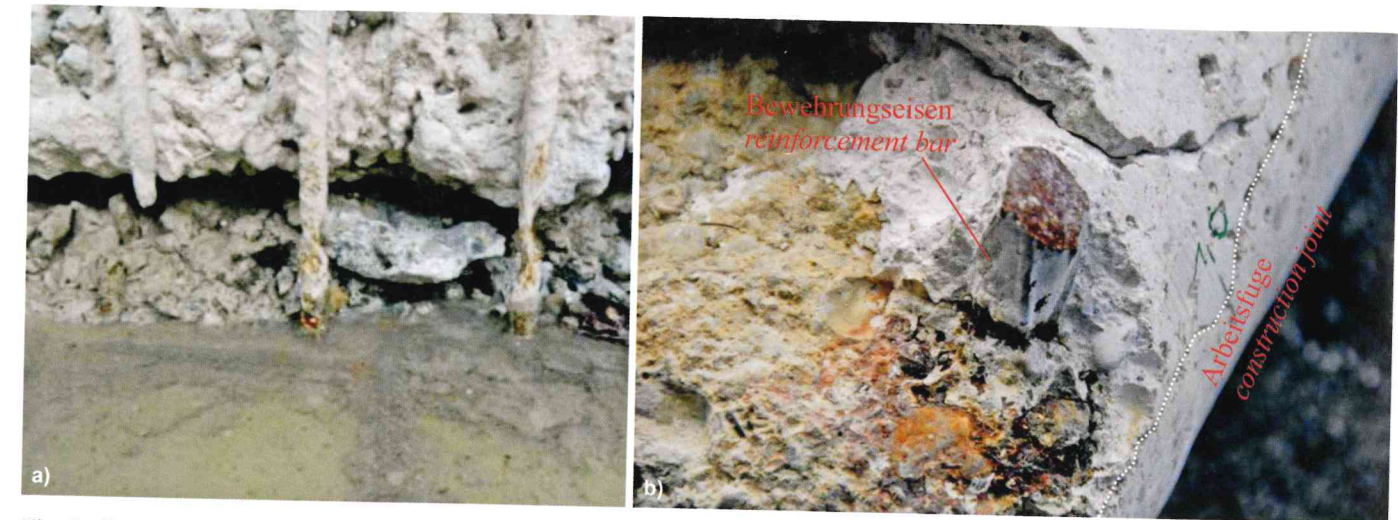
Corrosion damage along the construction joint of cantilever walls: a) distribution of corrosion to an exposed cantilever wall (adapted acc. to [4]); b) corrosion damage to the main reinforcement in a core drilling. Bild 1. Korrosionsschäden im Bereich der Arbeitsfuge von Winkelstützmauern: a) Verteilung der Bewehrungskorrosion entlang der freigelegten Fuge einer Winkelstützmauer (adaptiert nach [4]); b) Korrosionsschaden an der Hauptbewehrung einer entnommenen Kernbohrung
